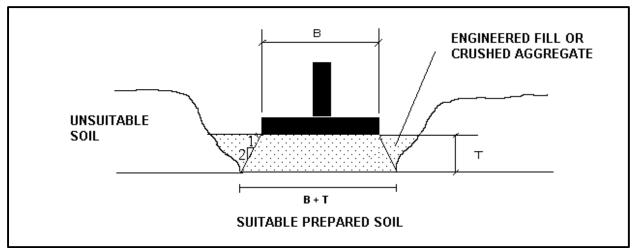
TYPICAL FOUNDATION UNDERCUTTING DIAGRAM
